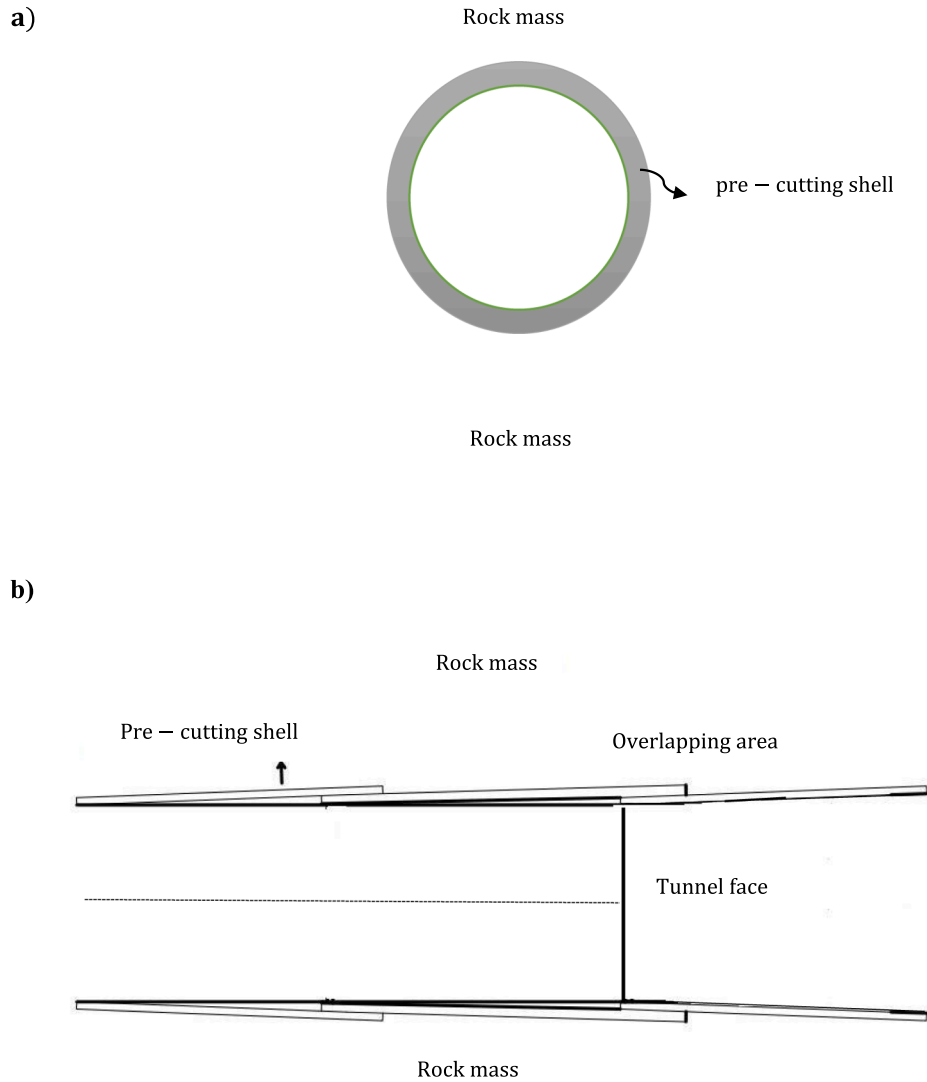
Schematic view of a pre-cutting tunneling system; a) in the tunnel cross-section, b) in the tunnel longitudinal direction.
